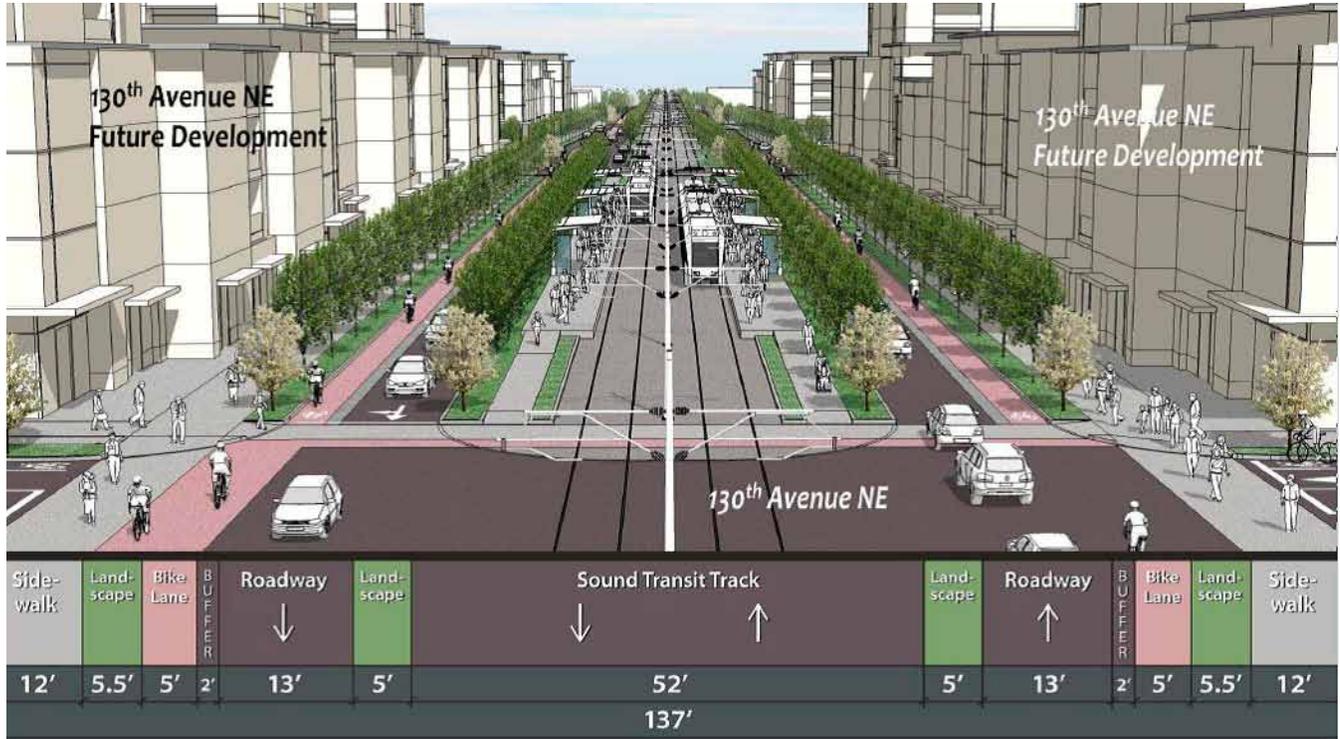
NE 16th Street Section at the 130th Ave NE Station
